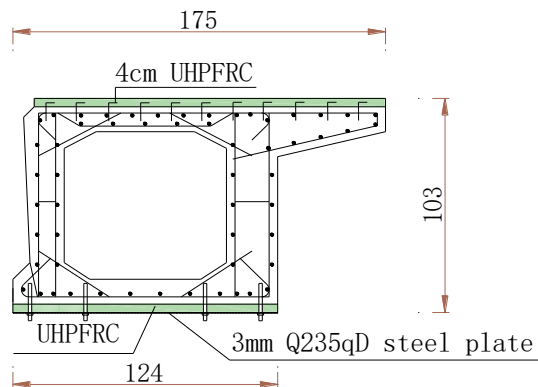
Full-scale test girder B2 after reinforcements (Unite: mm).
